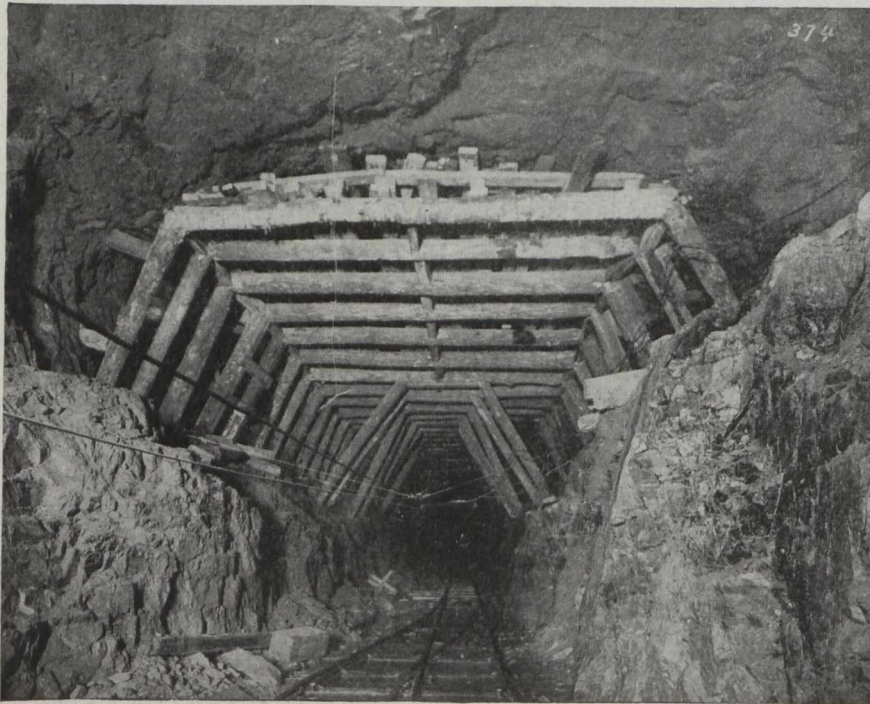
The Mount Royal Tunnel; timbering for the heading and completed "break-up." Bench not Removed.
